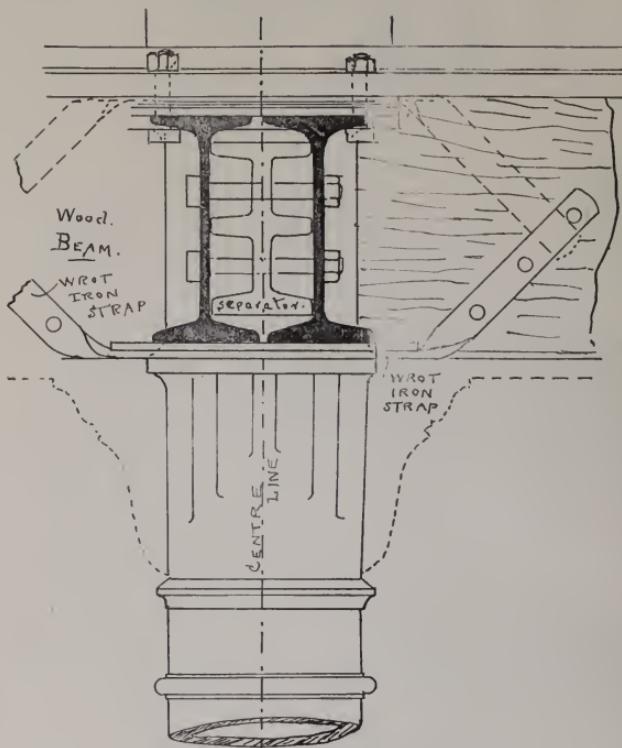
TRANSVERSE SECTION OF FLOOR.
